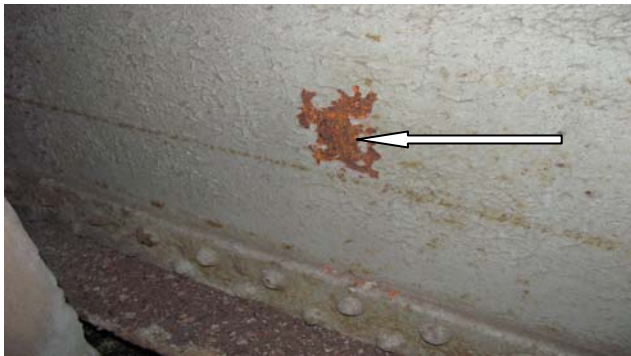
Gray over orange primer paint present on the structural steel of the three-hinged steel arched bridge.
